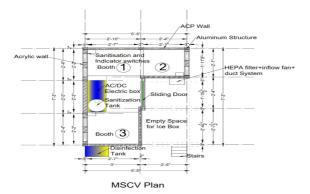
Schematic diagram showing the labelled sectional plan view of the booth.
